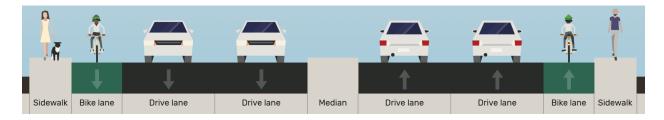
Typical Cross-Section—Alternative 2 (Some Side Street Restriction)
